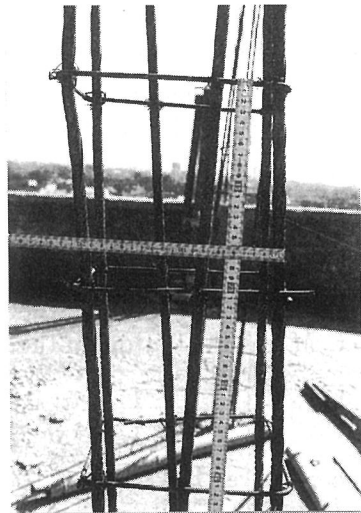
Arrangement of the reinforcing bars for a column of the six-story hotel under construction at Biratnagar, Nepal
